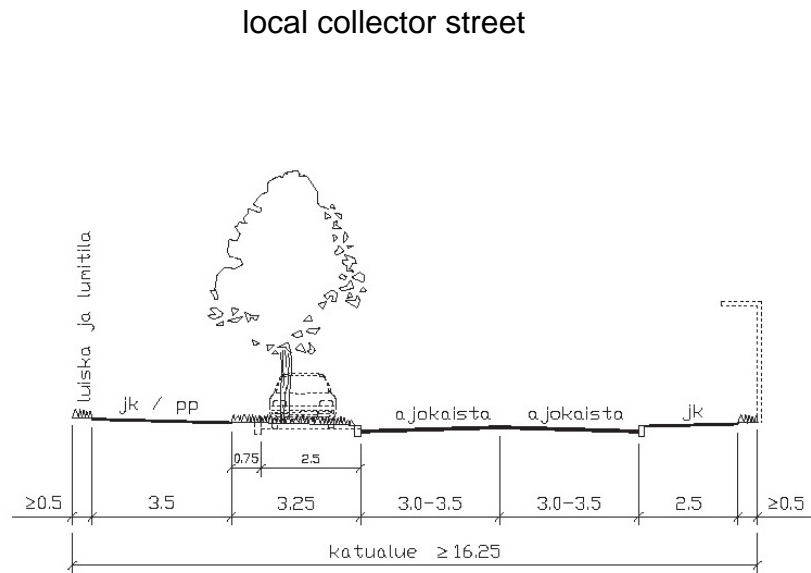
Cross section for local collector street in city of Tampere. (Cross sections for streets in the city of Tampere, 2008)
